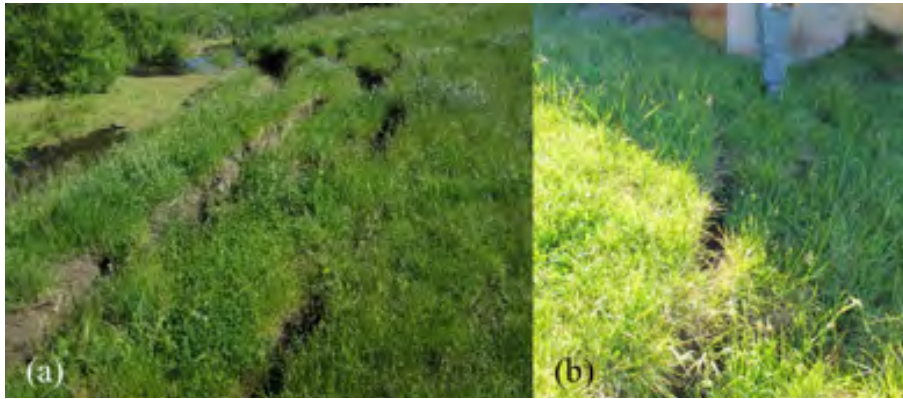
Free field lateral spreading cracks at Needles Creek Bridge site [-41.8217, 174.1370]: (a) Cracks along free face of the river; (b) Cracking near bridge pier.
